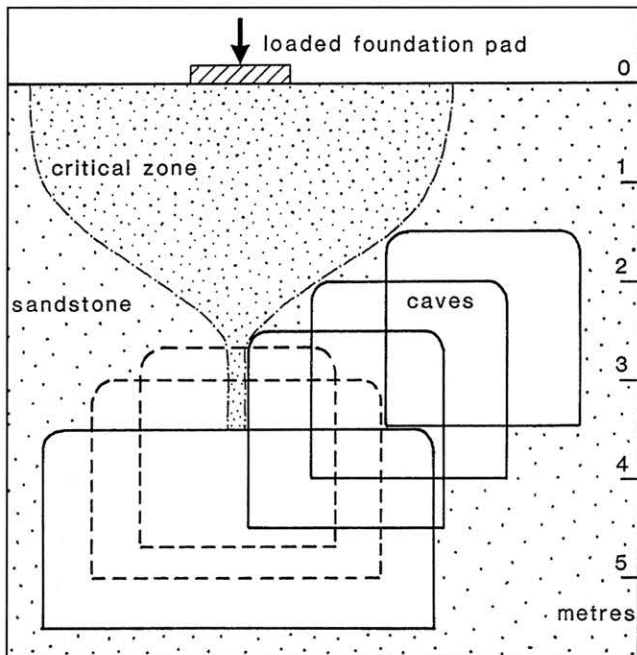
Cross section showing caves in Nottingham's sandstone, which are acceptable below a foundation pad. Sound rock has to be proven within the critical zone to avoid the threat of a punching failure, except where the caves shown with broken lines are stable due to their modest widths. Caves wider than 4 metres are uncommon, and may require a greater cover to ensure stability.
